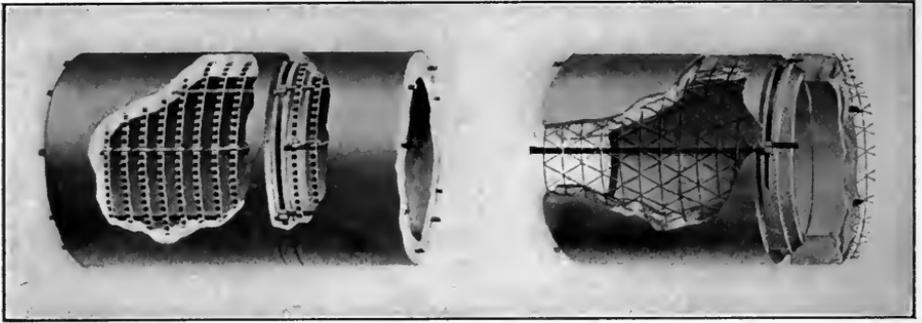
FIG. C.—Reinforced concrete pipe and lock joints made by Reinforced Concrete Pipe Co. of Los Angeles, Calif.
